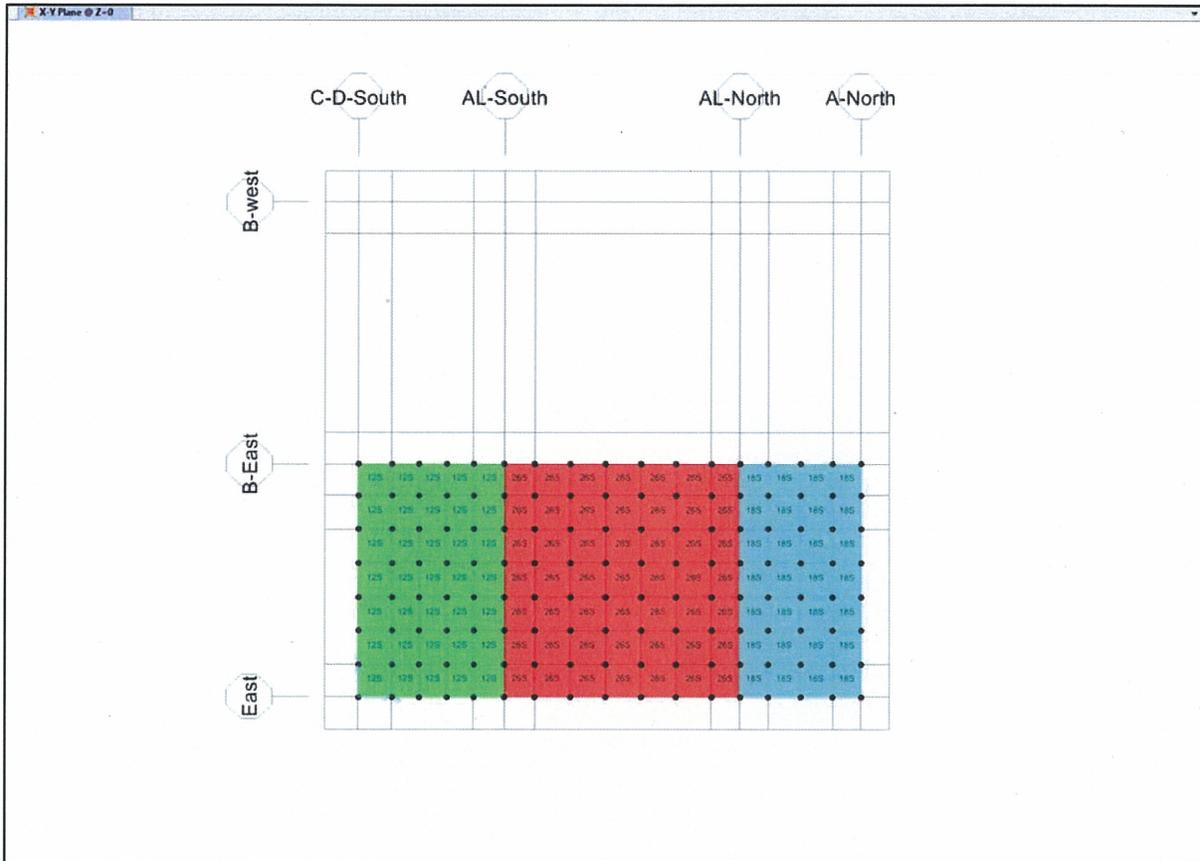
REC SAP2000 Floor Plan at Z = 0-ft
